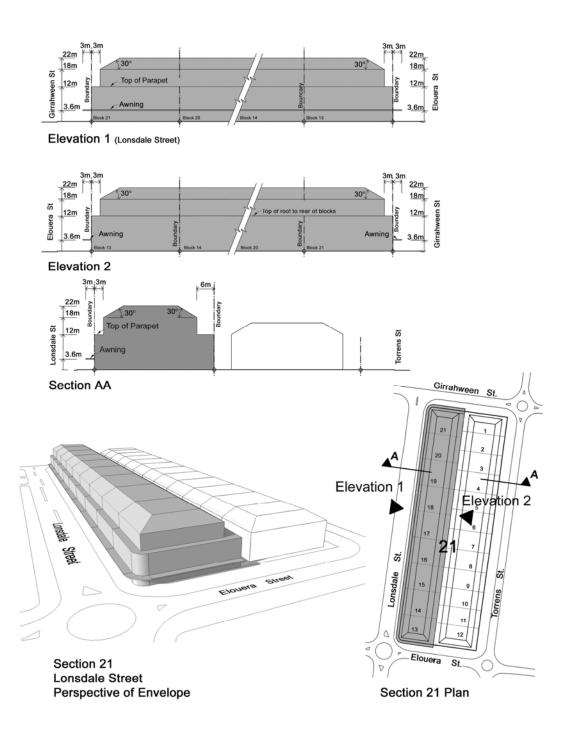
Building Envelope Diagram - Braddon Section 21 Blocks 13 – 21 (CZ3 Zone)
